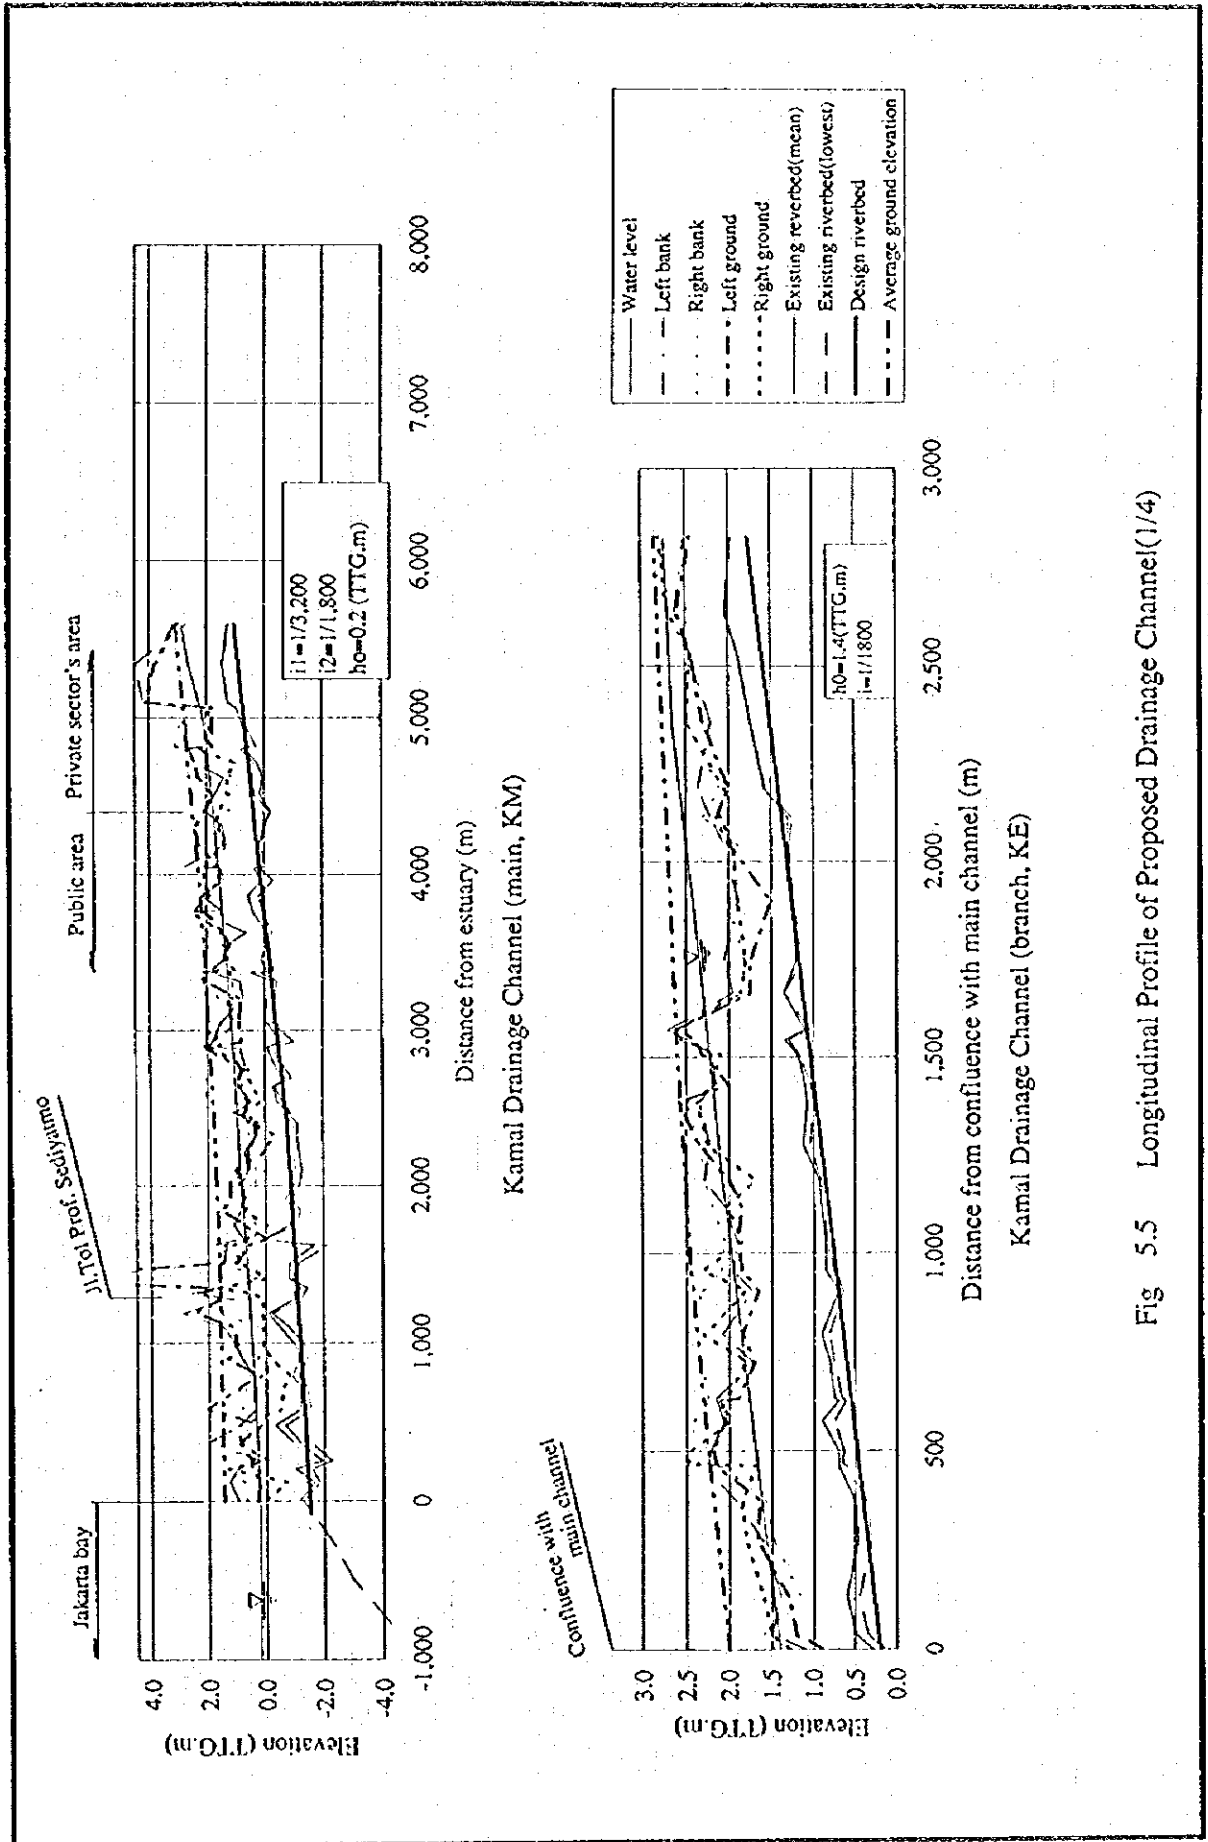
Longitudinal Profile of Proposed Drainage Channel(1/4)
